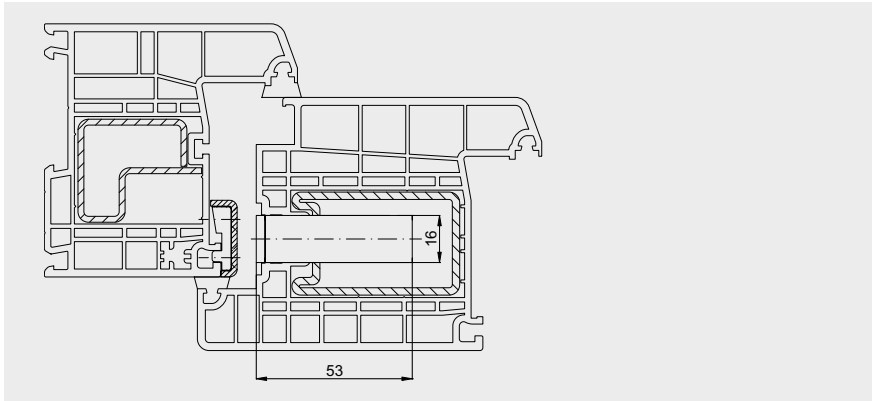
Location of the motor housing for blueMatic EAV (dimensions in mm)
